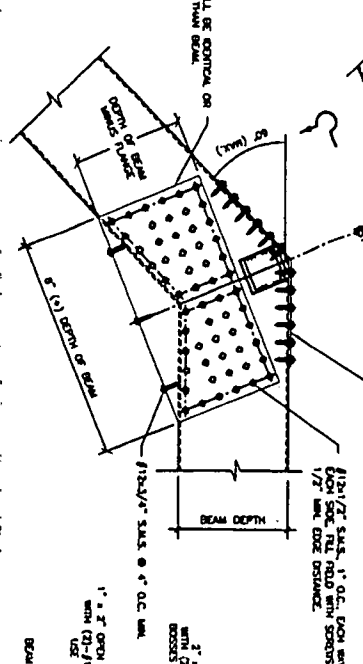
TYP. BEAM TO WALL CONNECTION
